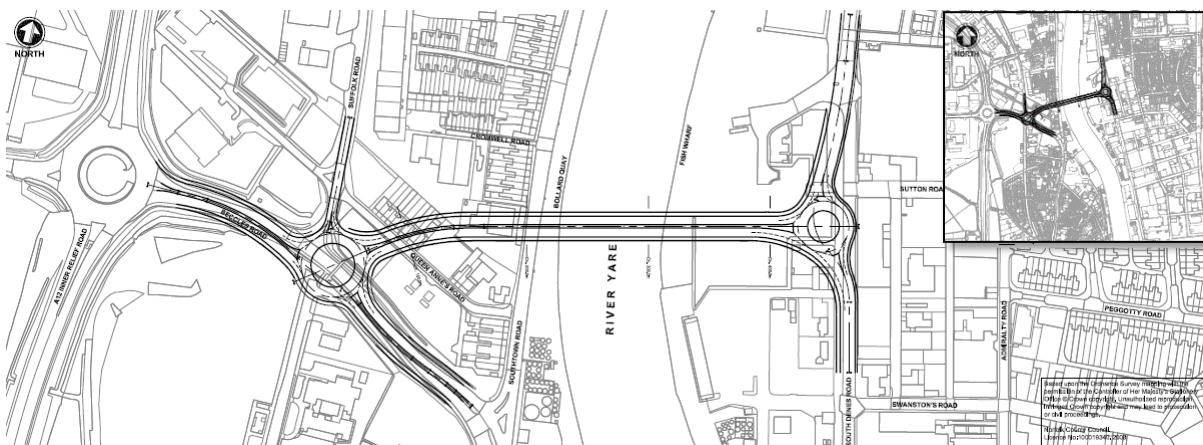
Alignment of the proposed bridge (Mouchel/WSP, 2017)
